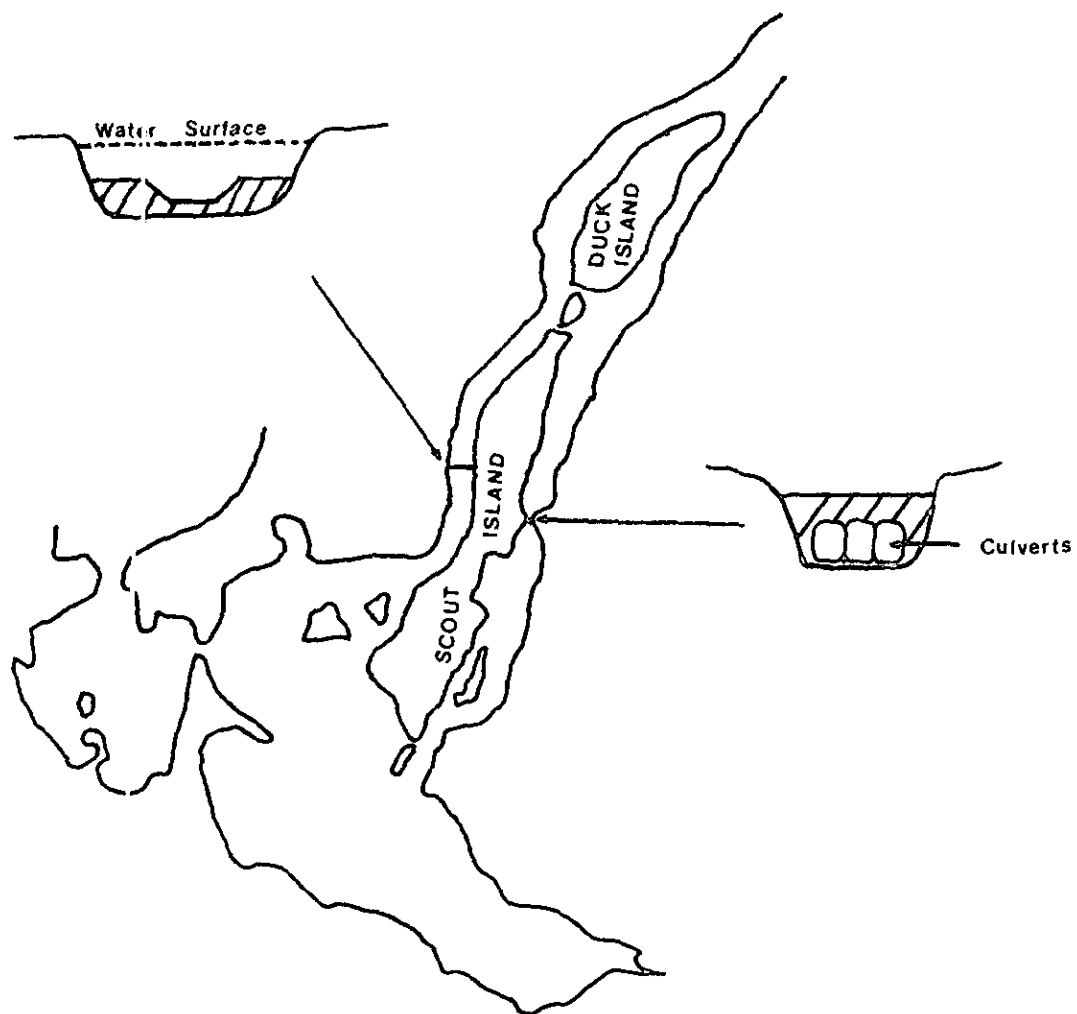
Location and design of weir structures proposed below Fort Peck Dam.
